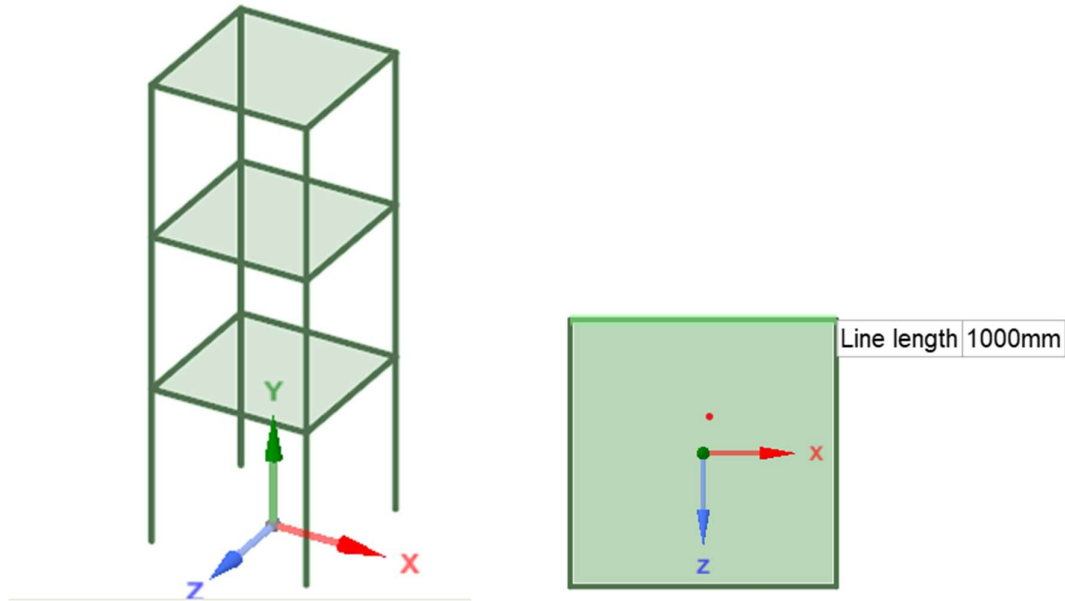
a) 3-D Ansys model of the frame, b) Structural plan
